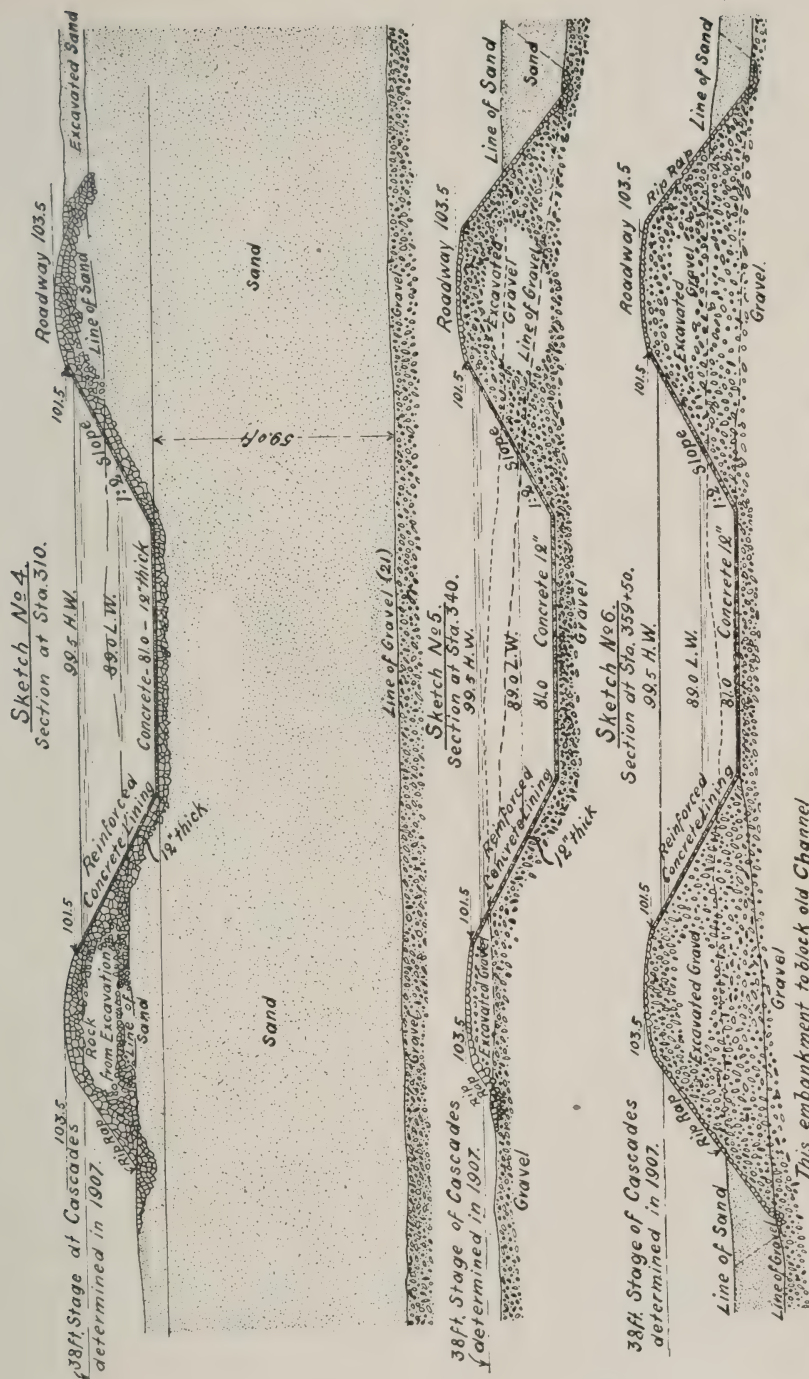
Typical cross sections of canal in sand and gravel as actually being constructed.
